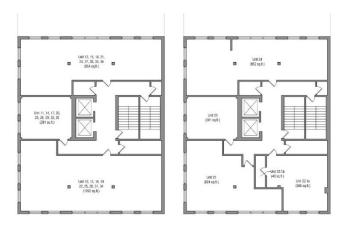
, 243 (left to right, top down): Building 8, eighth floor (1926); same floor (1981). I'' = 32'. North is to the left.
